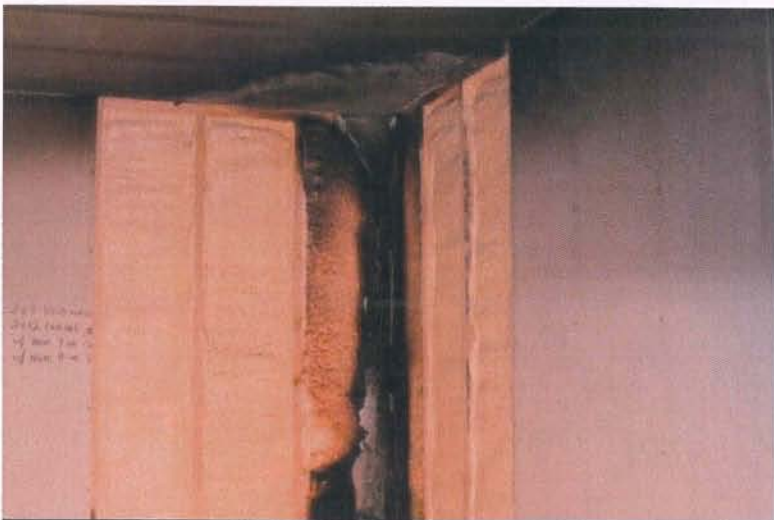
Post-Test: View of Burn Corner with Gypsum Removed.
